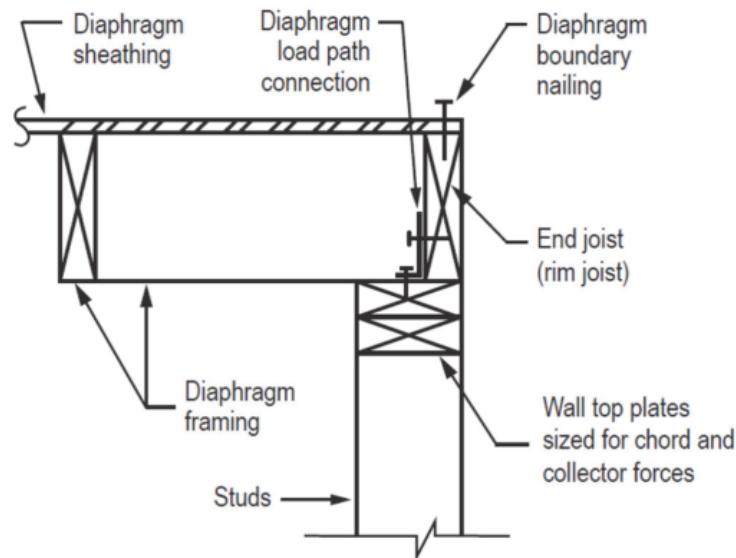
Use of blocking (or rim joist) to transfer shear loads and prevent joist roll-over
